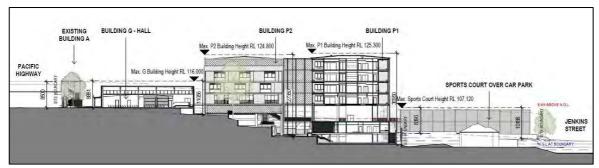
| CPS proposed east – west section, north facing (Source: RtS 2020)
